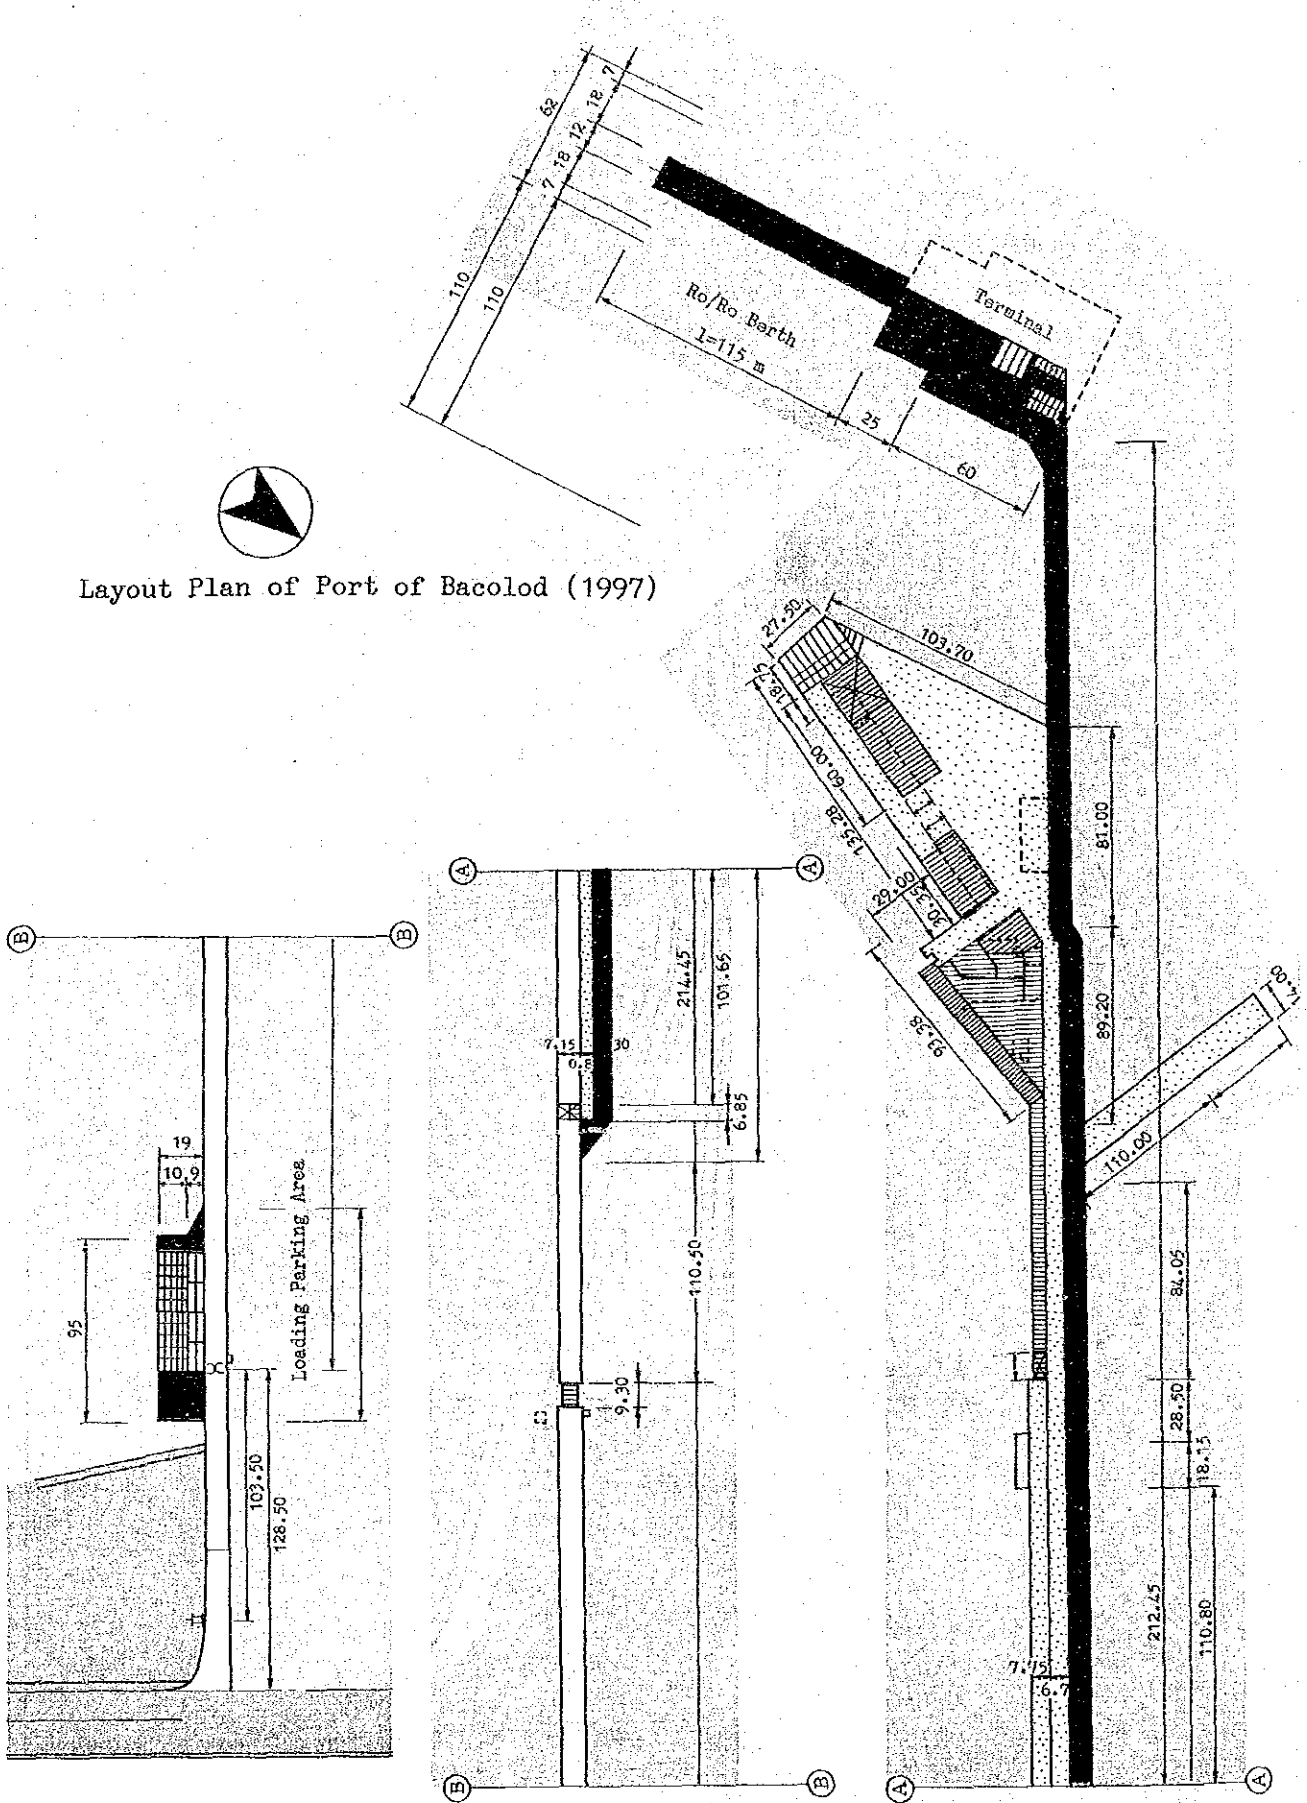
Short Term Ro/Ro Terminal Plan of Port of Bacolod
